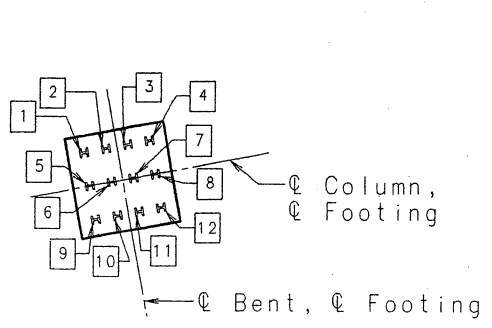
DETAIL OF FOOTING SHOWING TYPICAL PILE ORIENTATION FOR FOOTINGS A, B, C, & D
